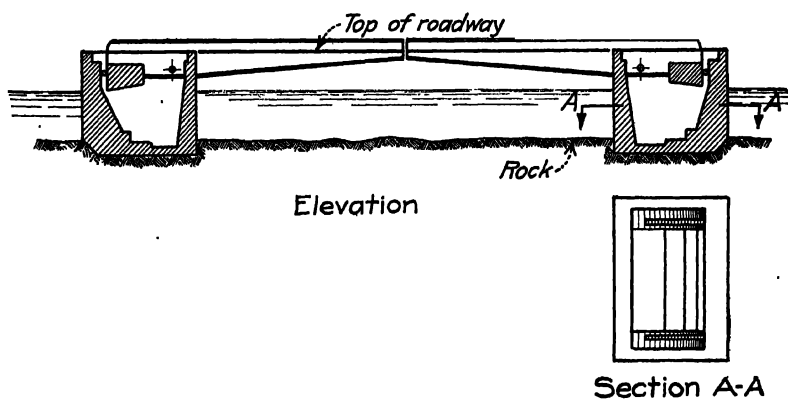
General design of Phoenix Bridge, built over the New York State Barge Canal; also 35th Street Bridge, Chicago, built 1914.
